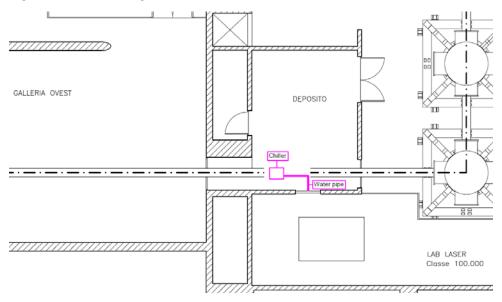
Laser Lab and Deposito Room as they are today. The Laser Chiller is below the Mode Cleaner tube
